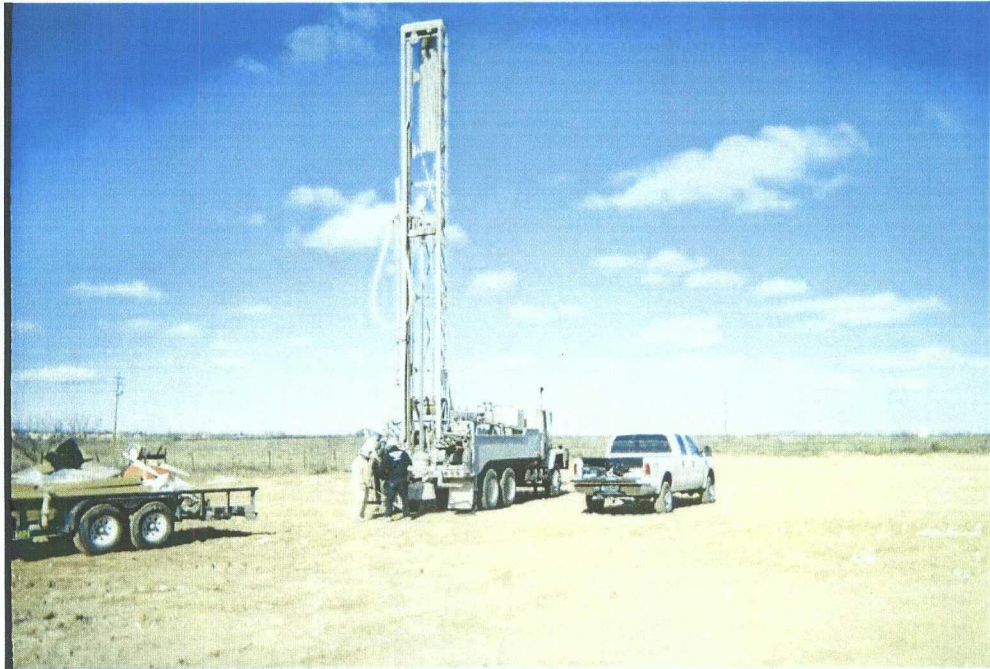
Photograph shows drill crew working on MW-7. Photo taken November 29, 2006, viewing northwest
